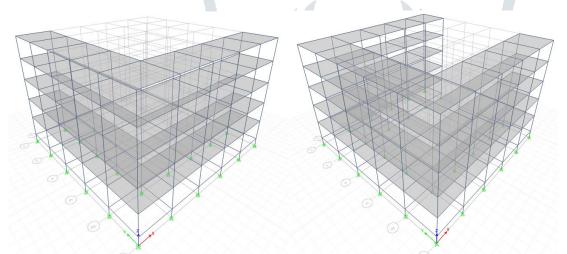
3D View of L- Shaped BuildingFig-2: 3D View of C- Shaped Building
